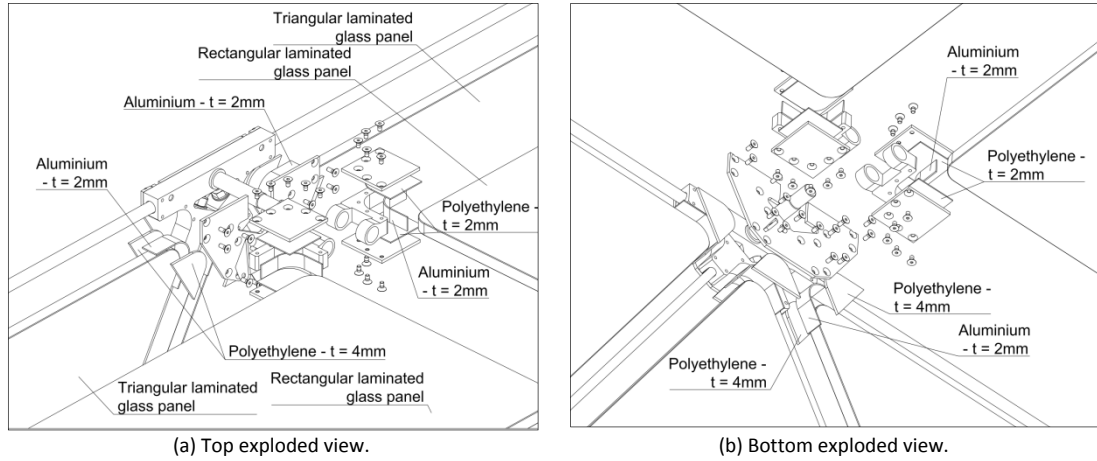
Exploded views with location of the alluminum elements and the polyethylene sheets.
